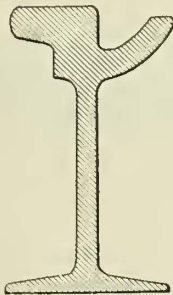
GROOVED GIRDER RAIL—NEW YORK TYPE.
